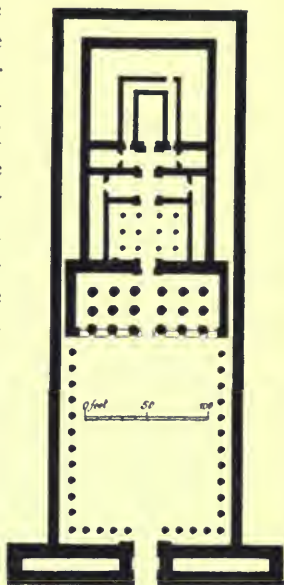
TEMPLE OF EDFOU. PLAN.
